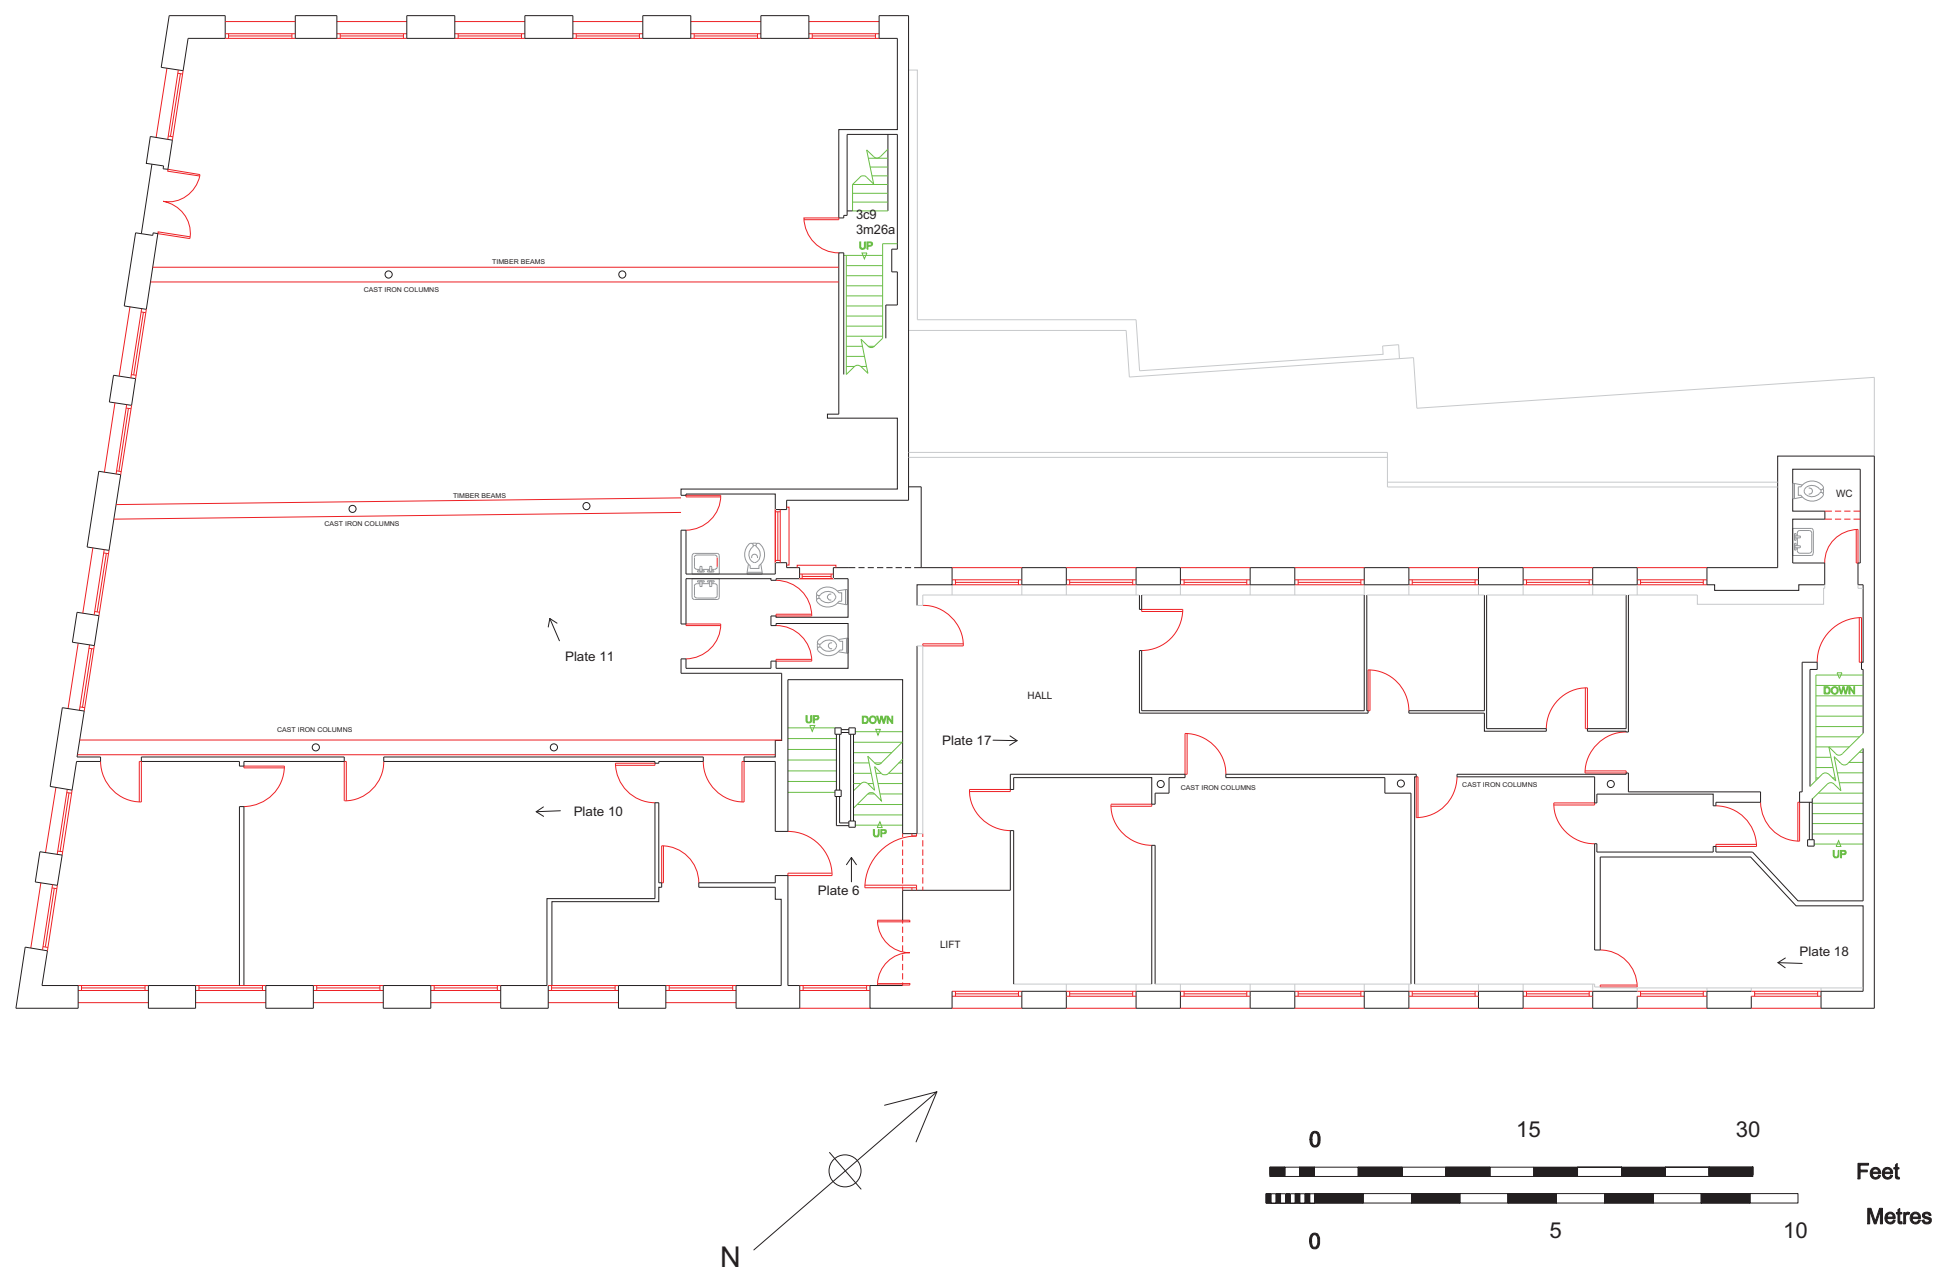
25-27 Bede Street First Floor Plan with plates located (based upon plans supplied by SV Surveyors Ltd)
